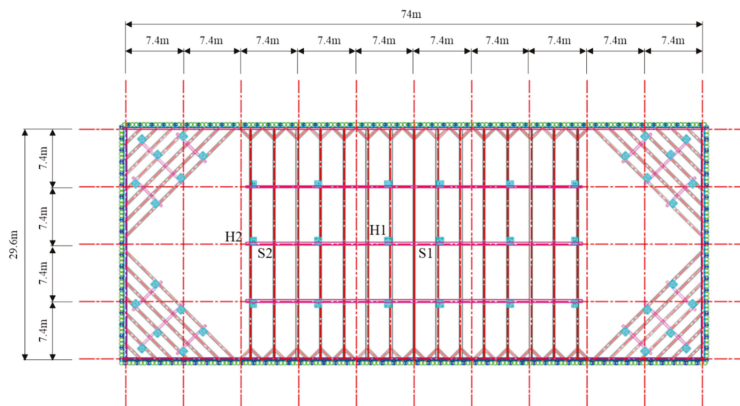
Temporary struts plan in the illustrative examples for the bottom-up method (unit: mm).
